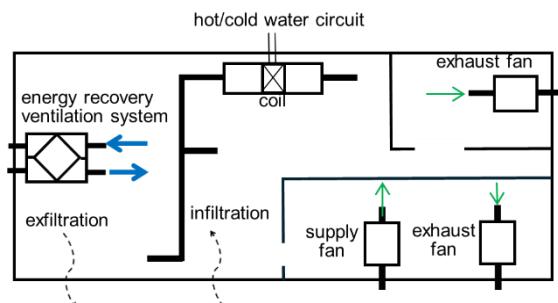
An example of building floor plan installed the HVAC system with an energy recovery ventilator and other mechanical ventilation equipment
